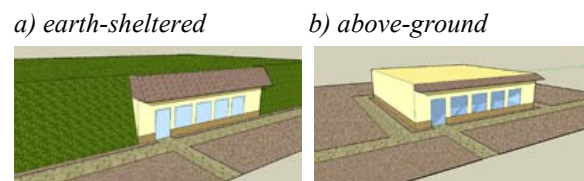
The analyzed schemes of: a) earth-sheltered and b) above-ground buildings
